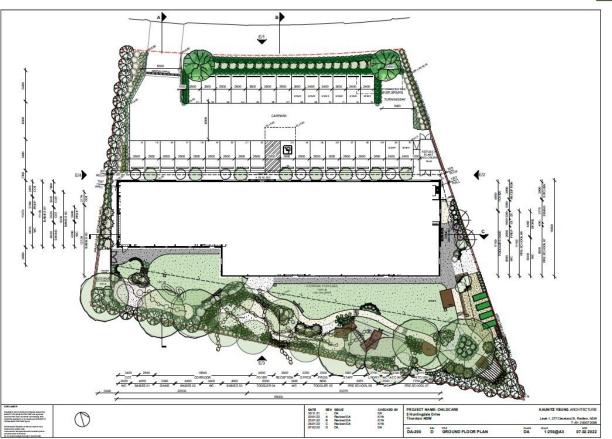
Plan of Proposed Development (Source: Kaunitz Yeung Architecture)
